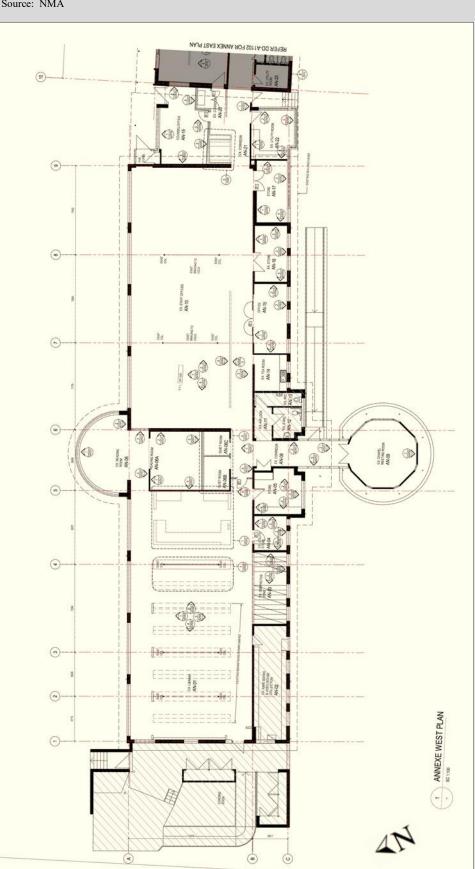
Acton Peninsula Building 1 – former TB Ward – Floor Plan Source: NMA
